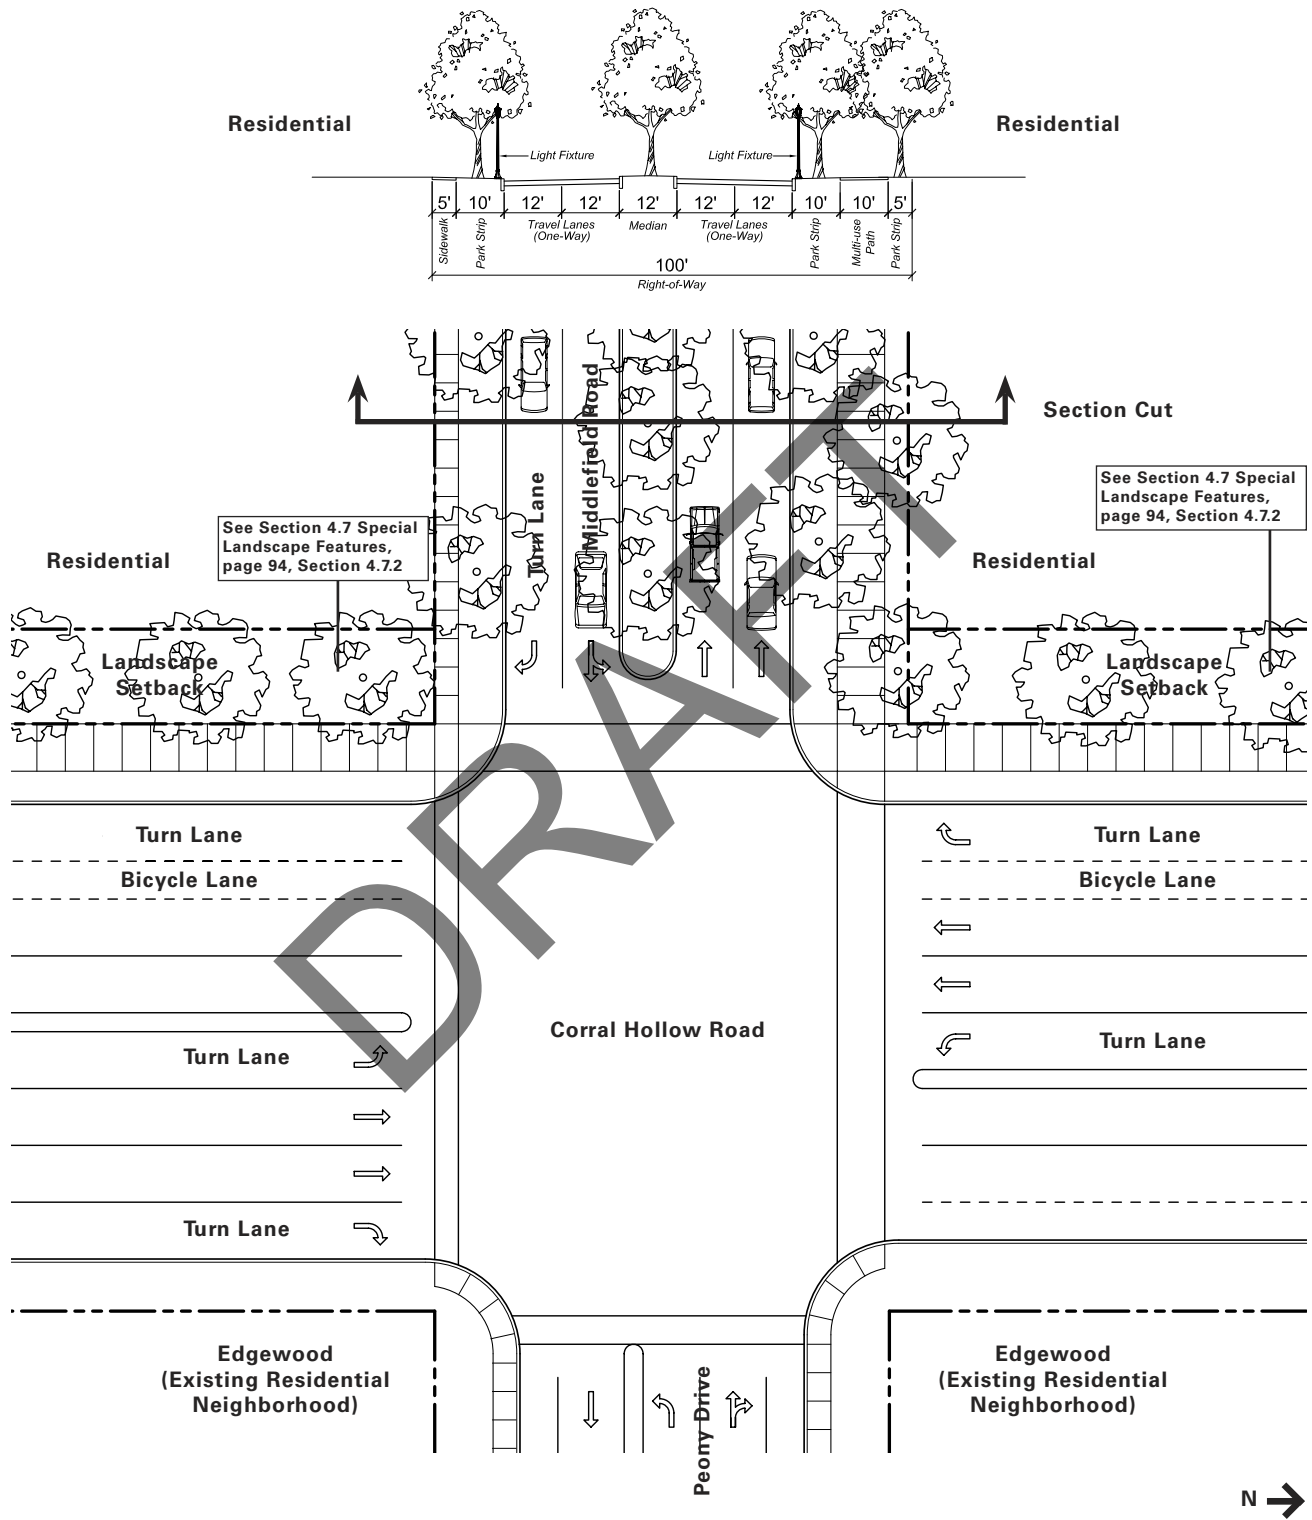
Proposed Section and Plan: Entry Street B
